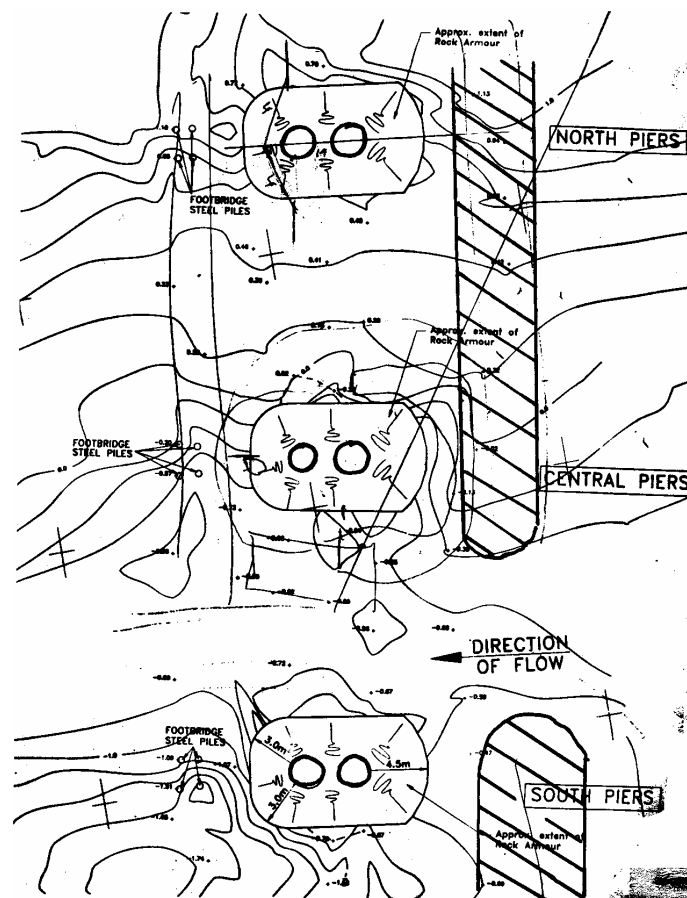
Plan view of Viaduct with temporary causeways shown (shaded area)
